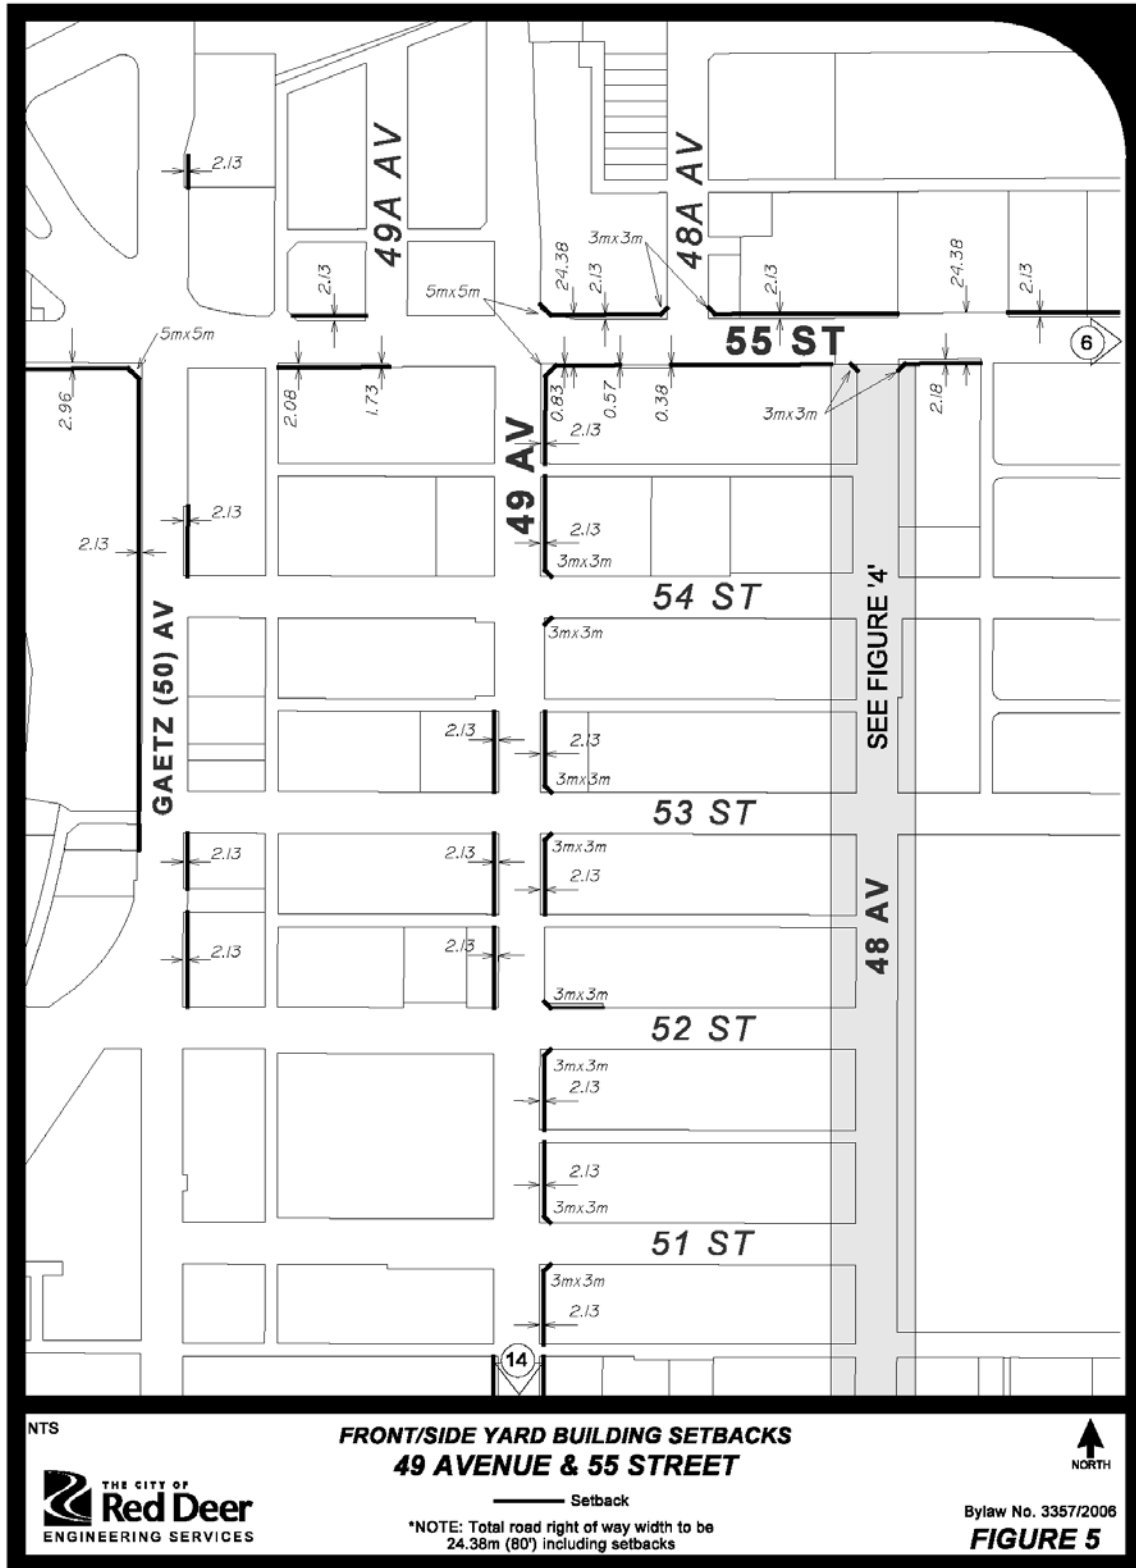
Front/Side Yard Building Setbacks 49th Avenue & 55 Street
